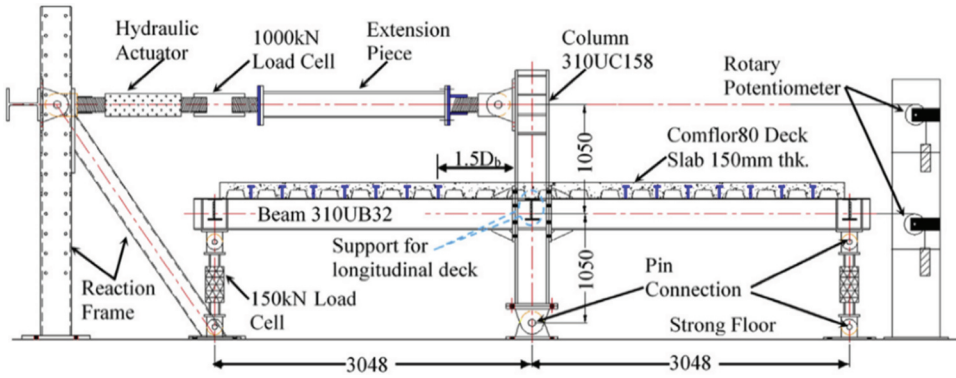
Elevation of test setup (Chaudhari 2017; Chaudhari et al. 2019).
